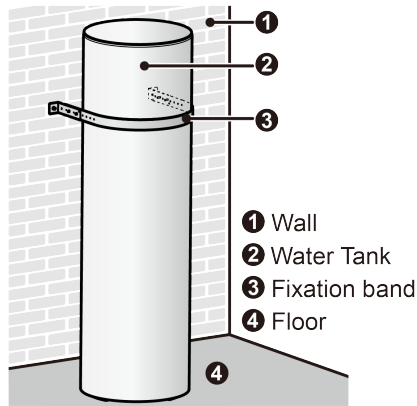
Fixing Installation schematic diagram of the water Tank
